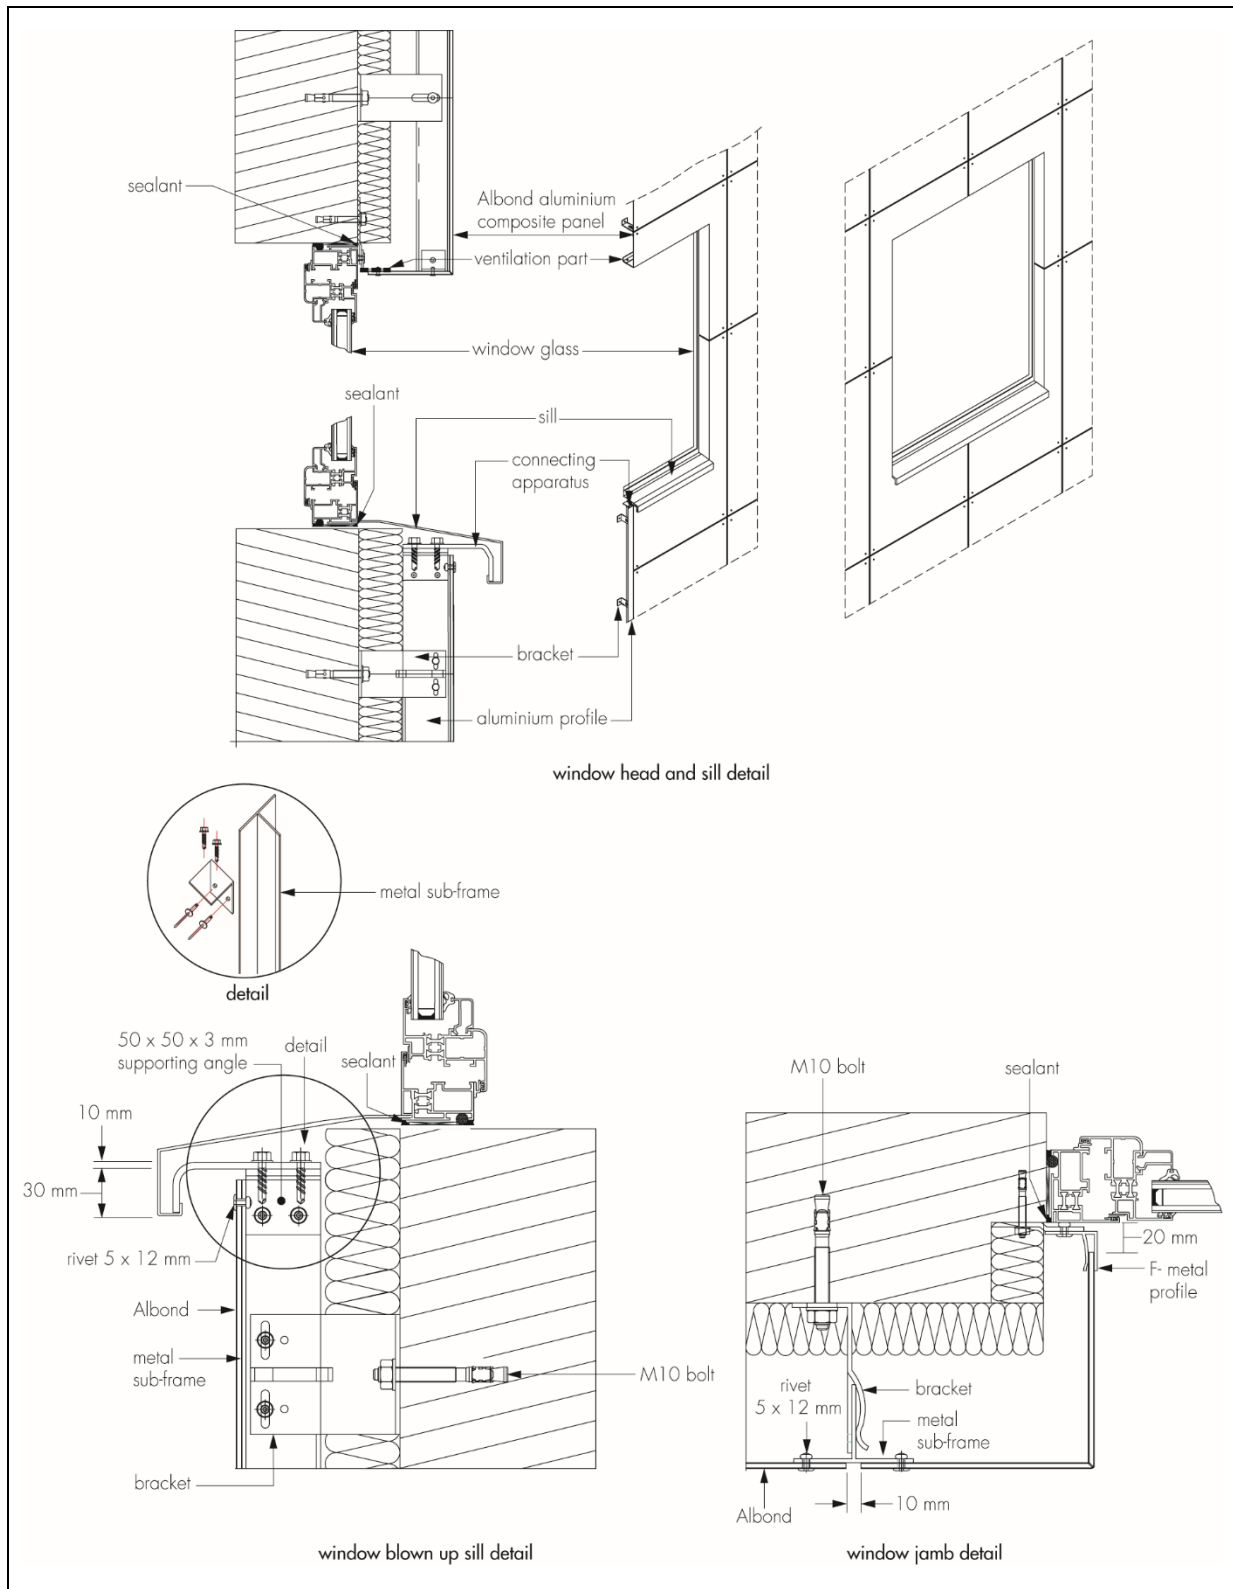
Typical installation details for Albond 9000/FR Cladding Panels (continued)
